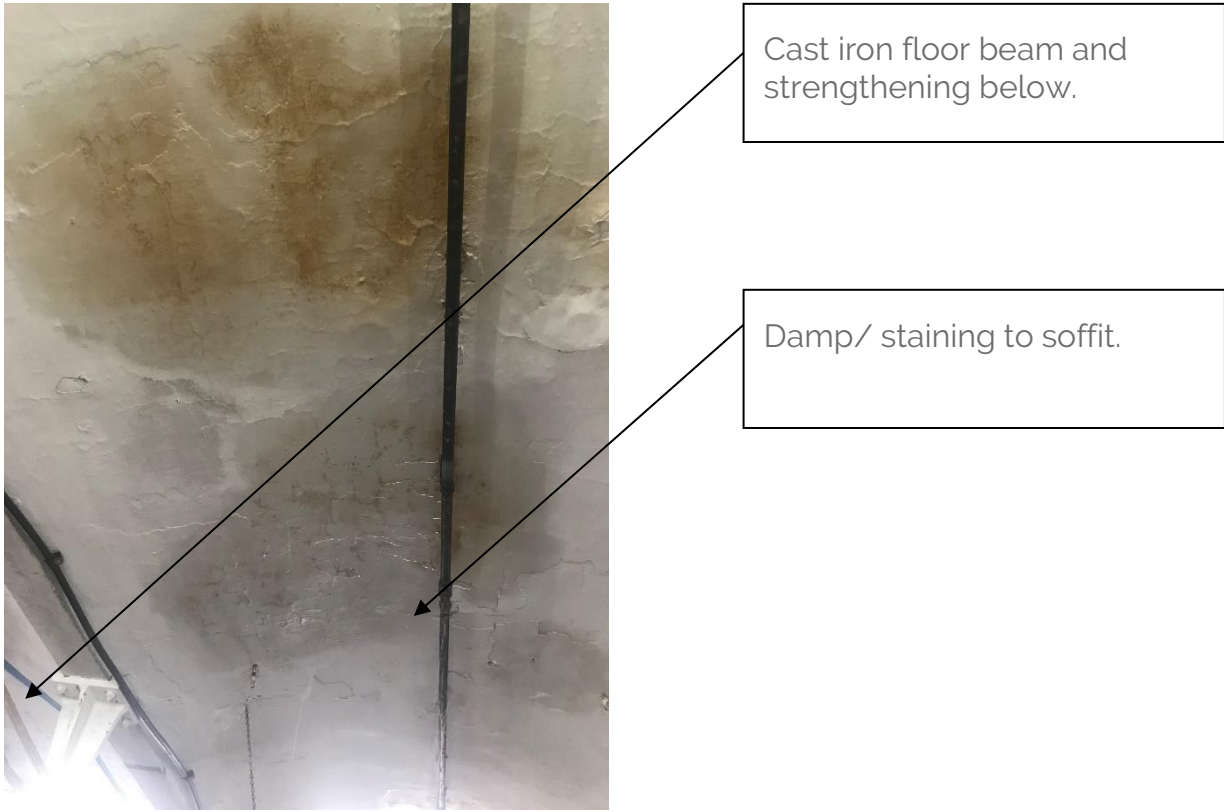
Staining to Soffit of Second Floor (Internal Bay Only)
